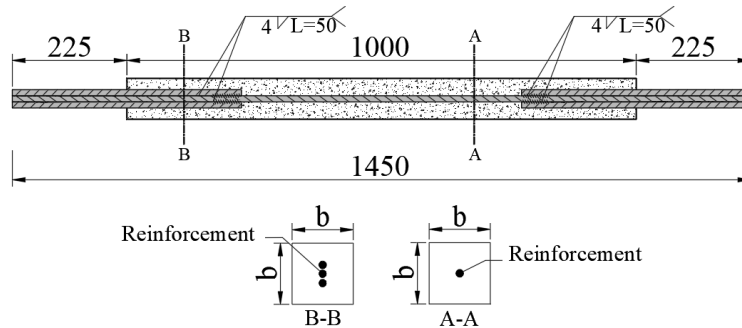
6: Specimen reinforcement details (units in mm), prismatic reinforcement specimen with main and complimentary rebars.
